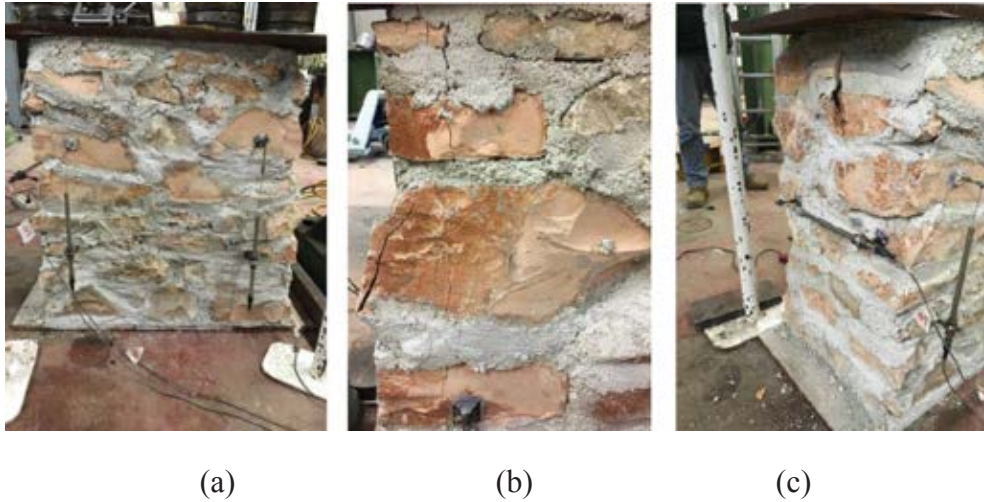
(a) Installed displacement transducers on the wall matrix, (b, c) damage on the specimen caused by the load - bearing test.
